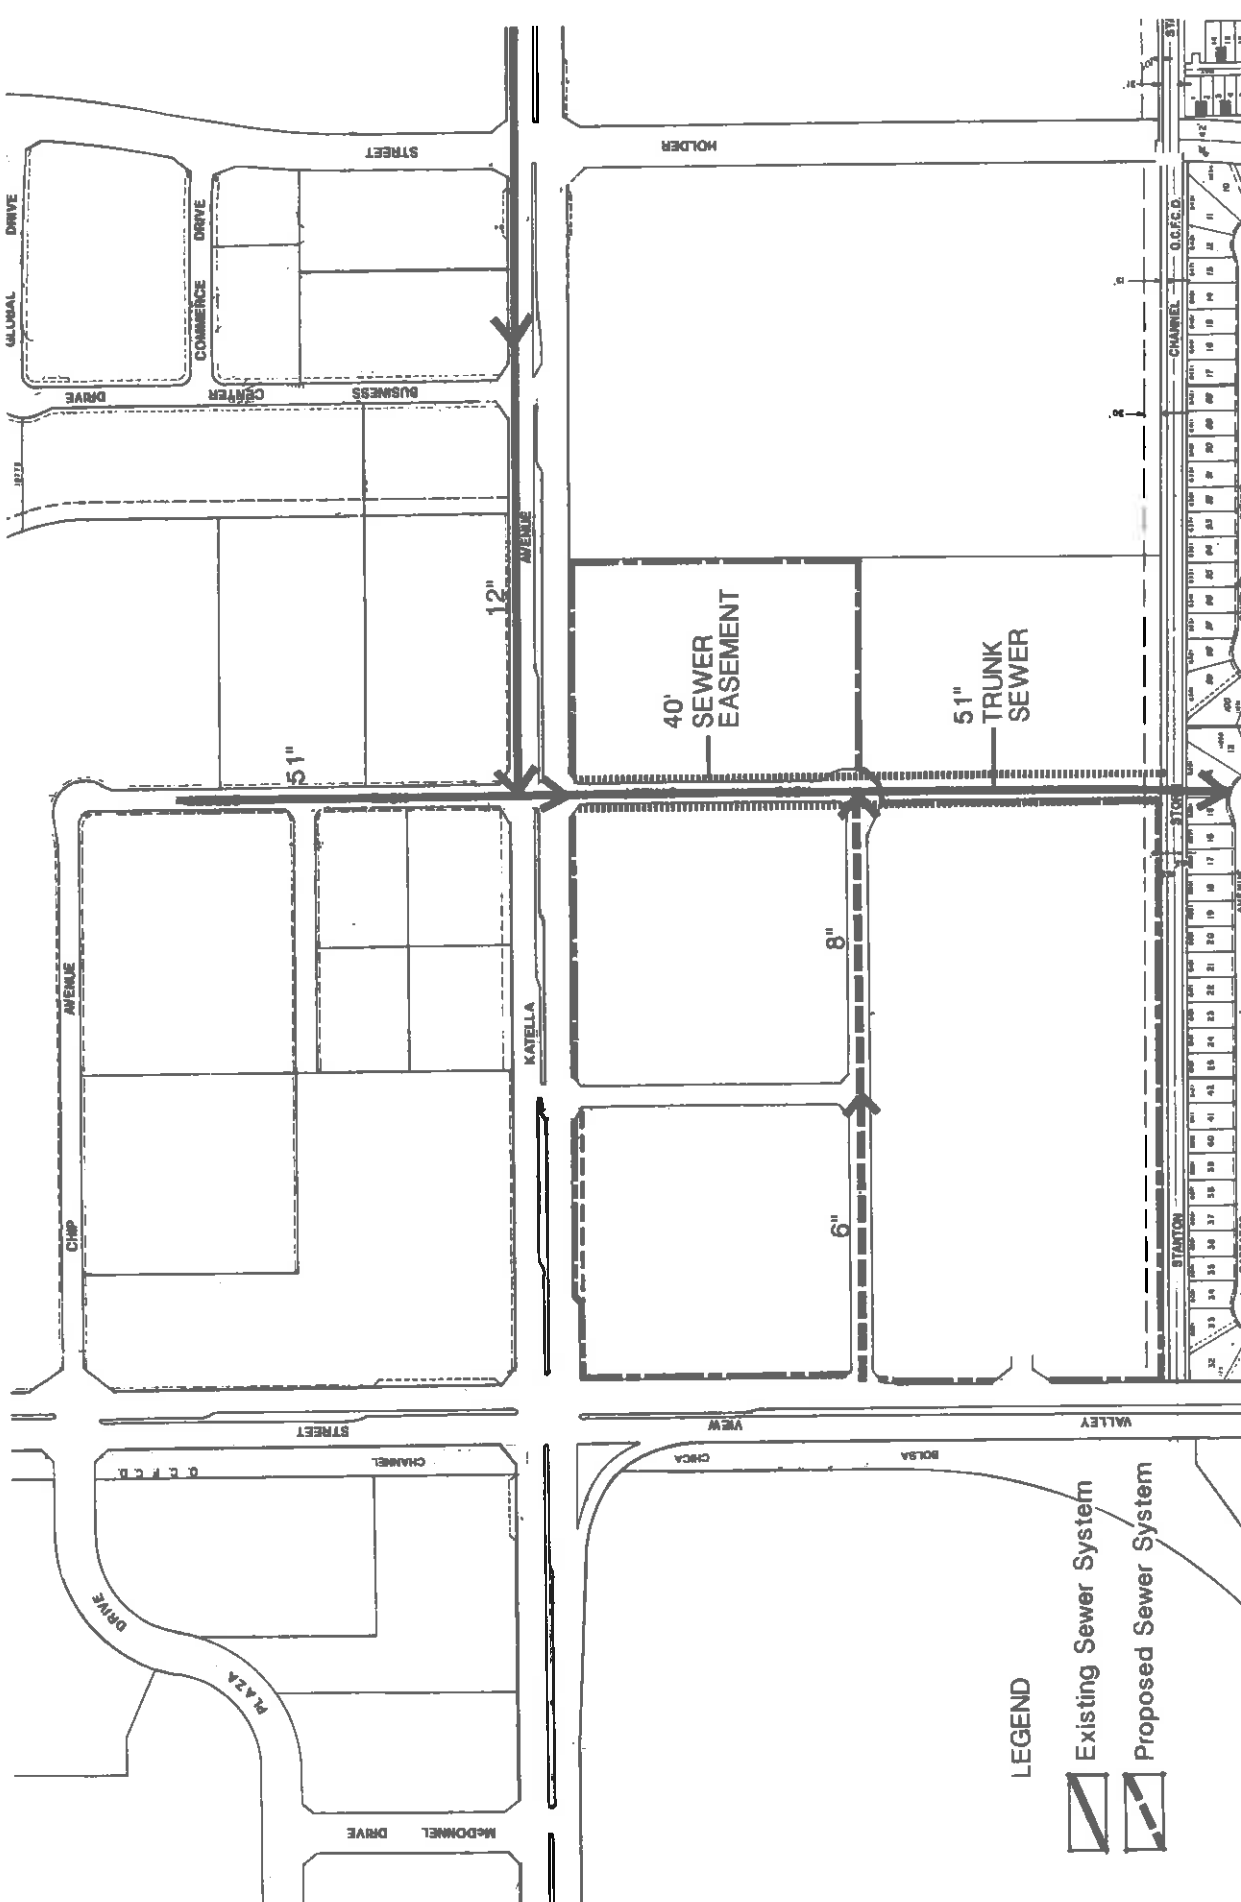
illustrates the wastewater system concept plan and includes existing wastewater collection facilities. The precise size and location of proposed lines will be determined prior to final tract map approvals by the City Council and will be based upon the specific needs of the service area.
